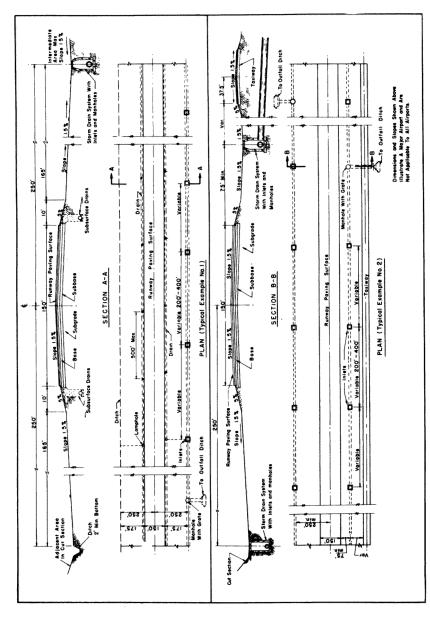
A typical runway safety area and runway drainage cross-section. (Source: Reference 1)
